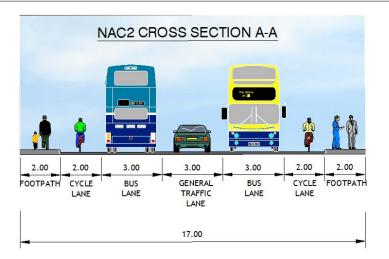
Route Option NAC2: Proposed Cross Section of Nutgrove Avenue – Churchtown.
